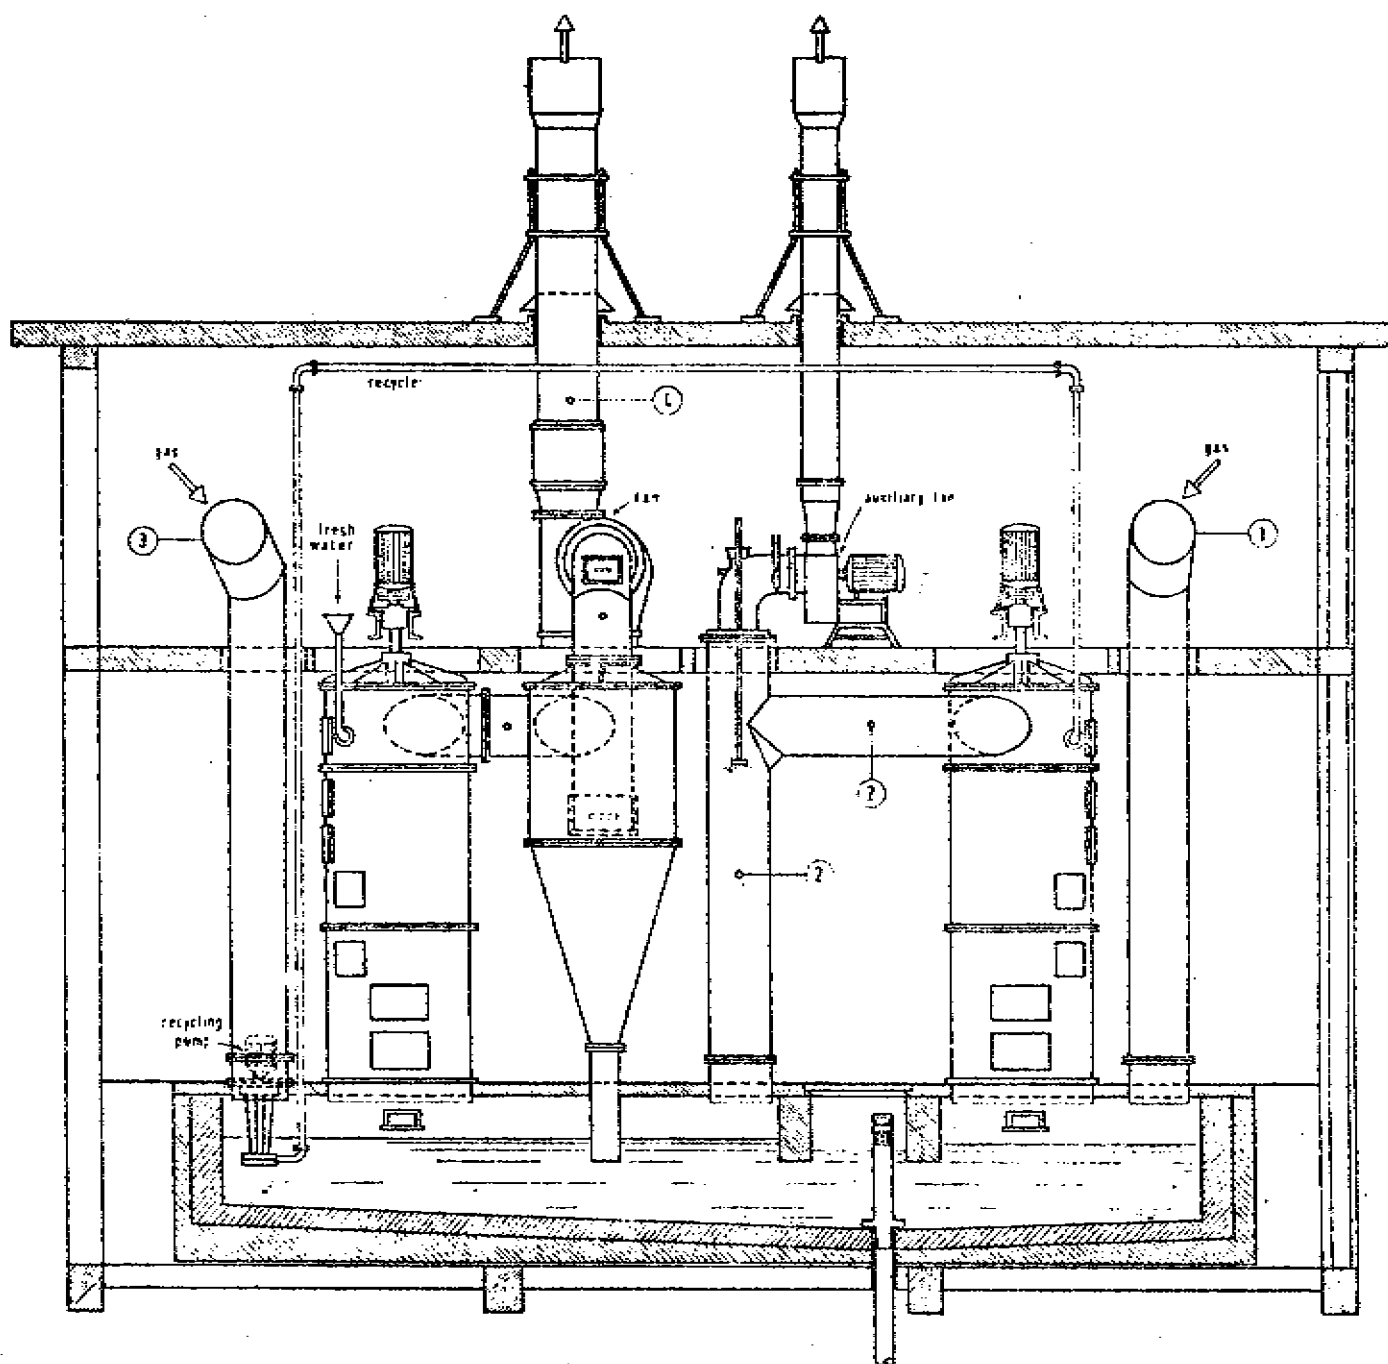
PLAN OF SiF₄ SCRUBBING PLANT
